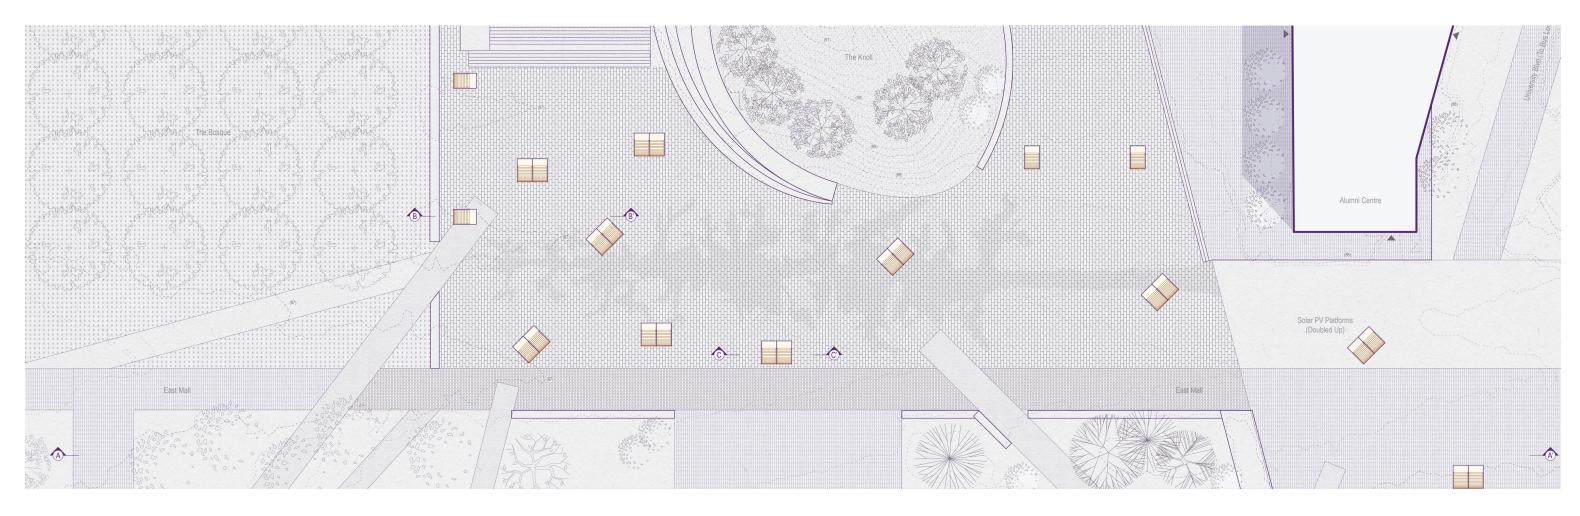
(above). AMS Plaza Plan. 2022, by author. (not to scale on a 8.5x11 sheet)
